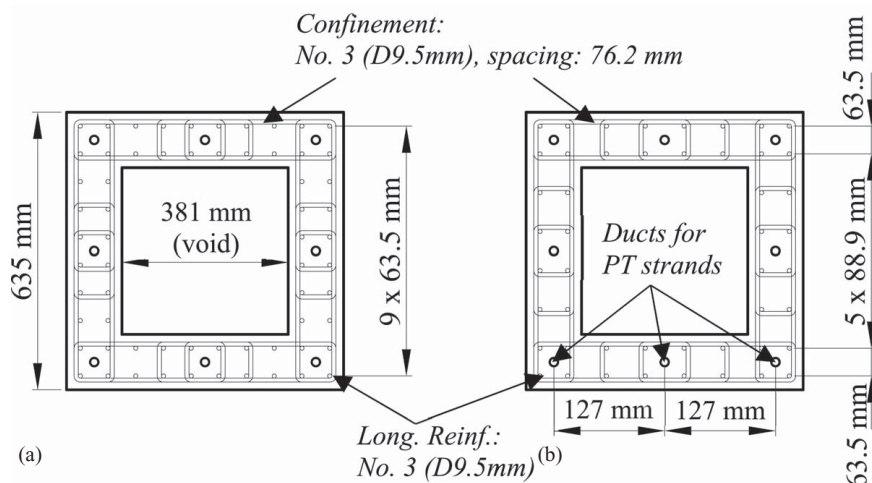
Reinforcement details of the rectangular hollow sections for (a) rocking column; and (b) bending column segments (1 mm = 0.039 in.).
